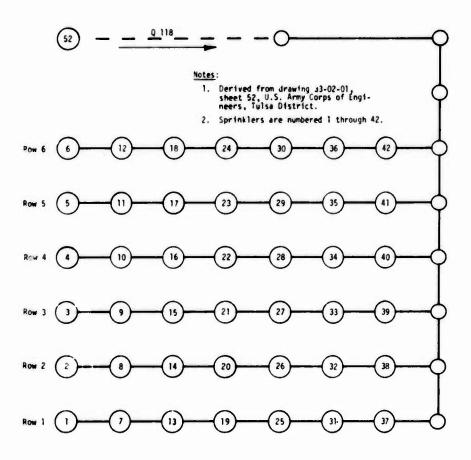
Sprinkler System in Building 416 at Tinker Air Force Base
